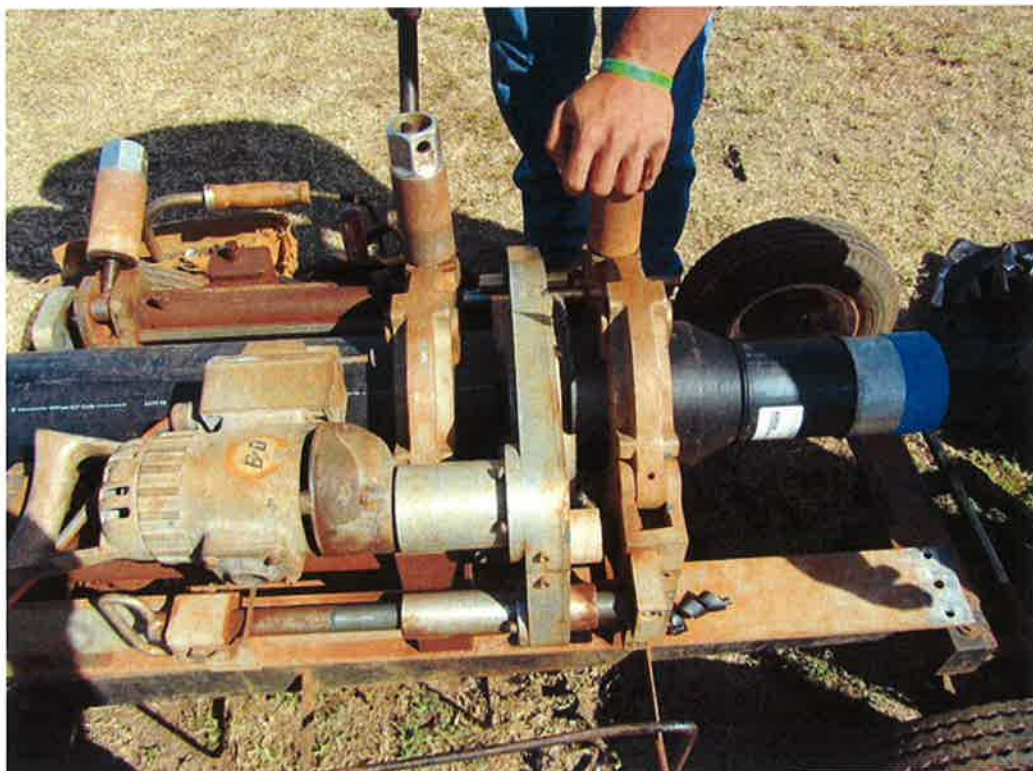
HDPE pipe welding to connect cleanout risers pipe in Wet Well #2.
